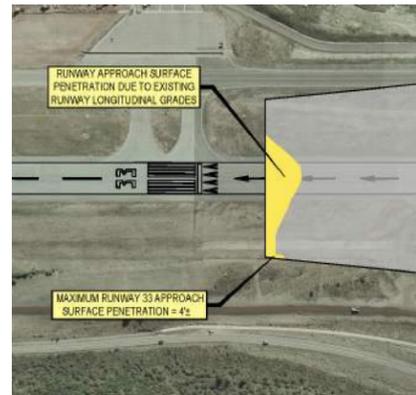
Runway 33 Approach Surface Penetrations - 25' Runway Shift - 3,500' to 5,000' South (Appendix D, Alternatives 5a and 10, Sheets 11 of 16 and 12 of 17)
